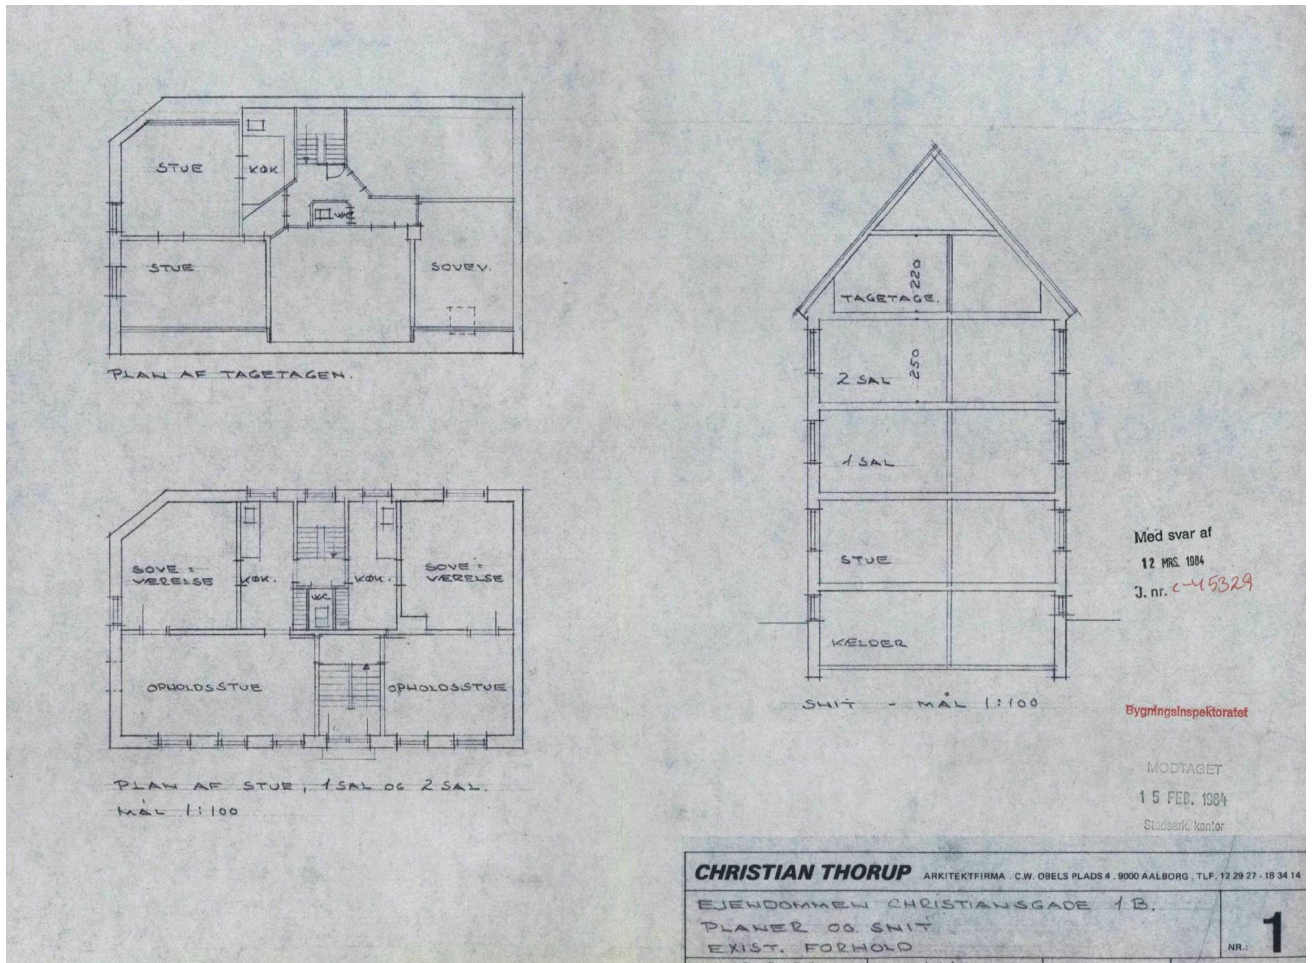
Plan of the attic, ground floor, 1st and 2nd floors and section
